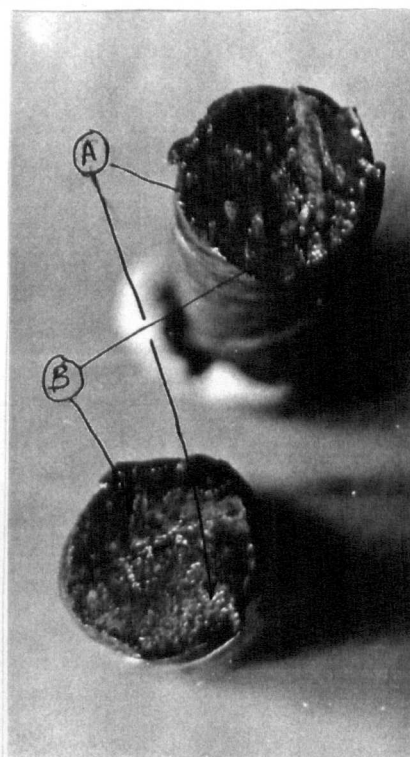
Beam MU75W; fracture surfaces.
